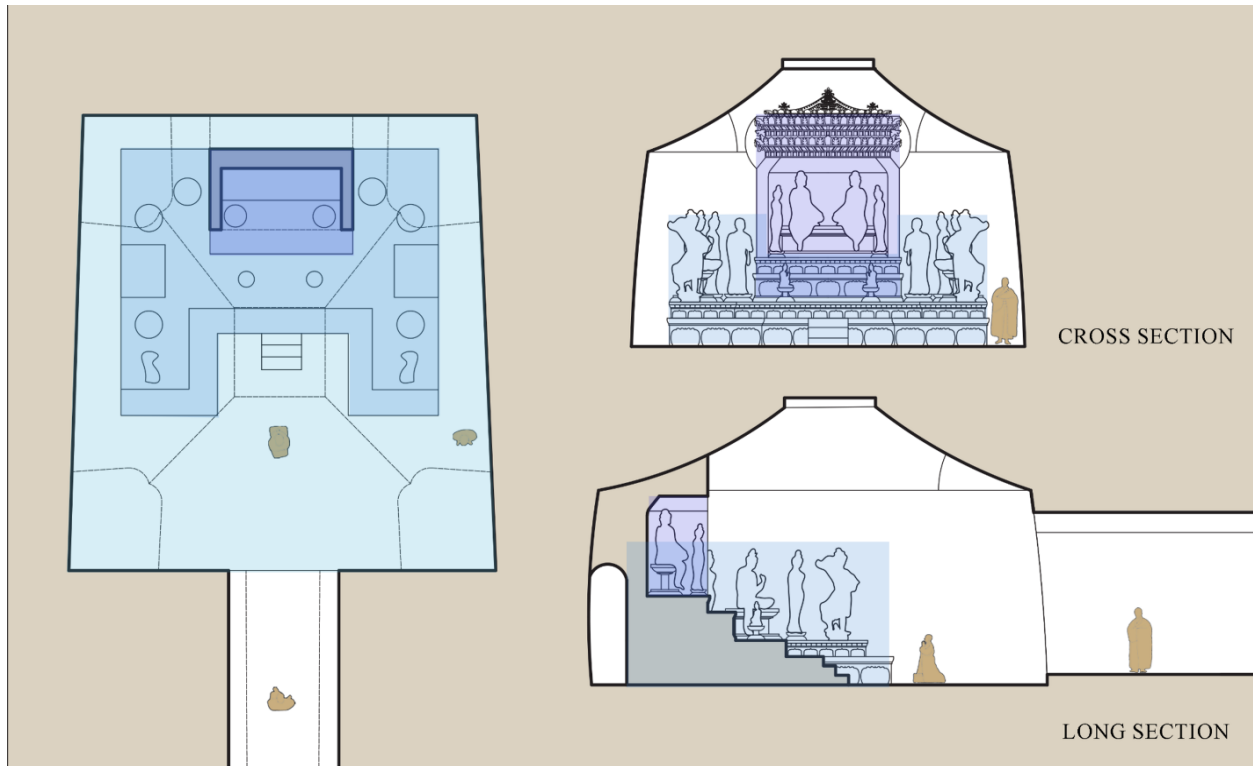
Plan and sectional drawings of Cave 454 showing author's reconstructual design of the central-pillared design possibility. Purple, blue, and light blue colors highlight the innermost, the intermediate, and the outermost tiers of space. Drawing by author.
